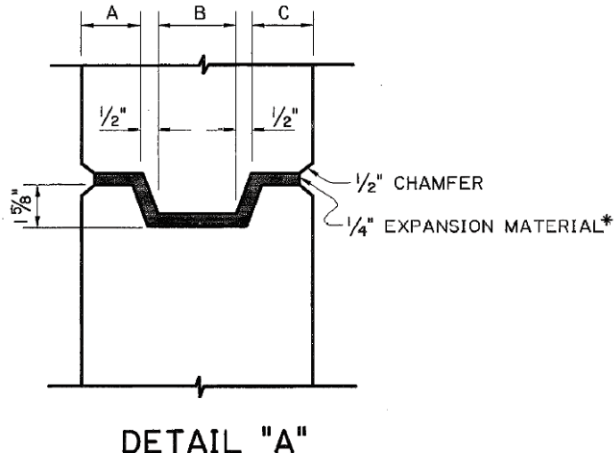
La DOTD Transverse Expansion Joint Details for Culvert Barrels (La DOTD 2008)
